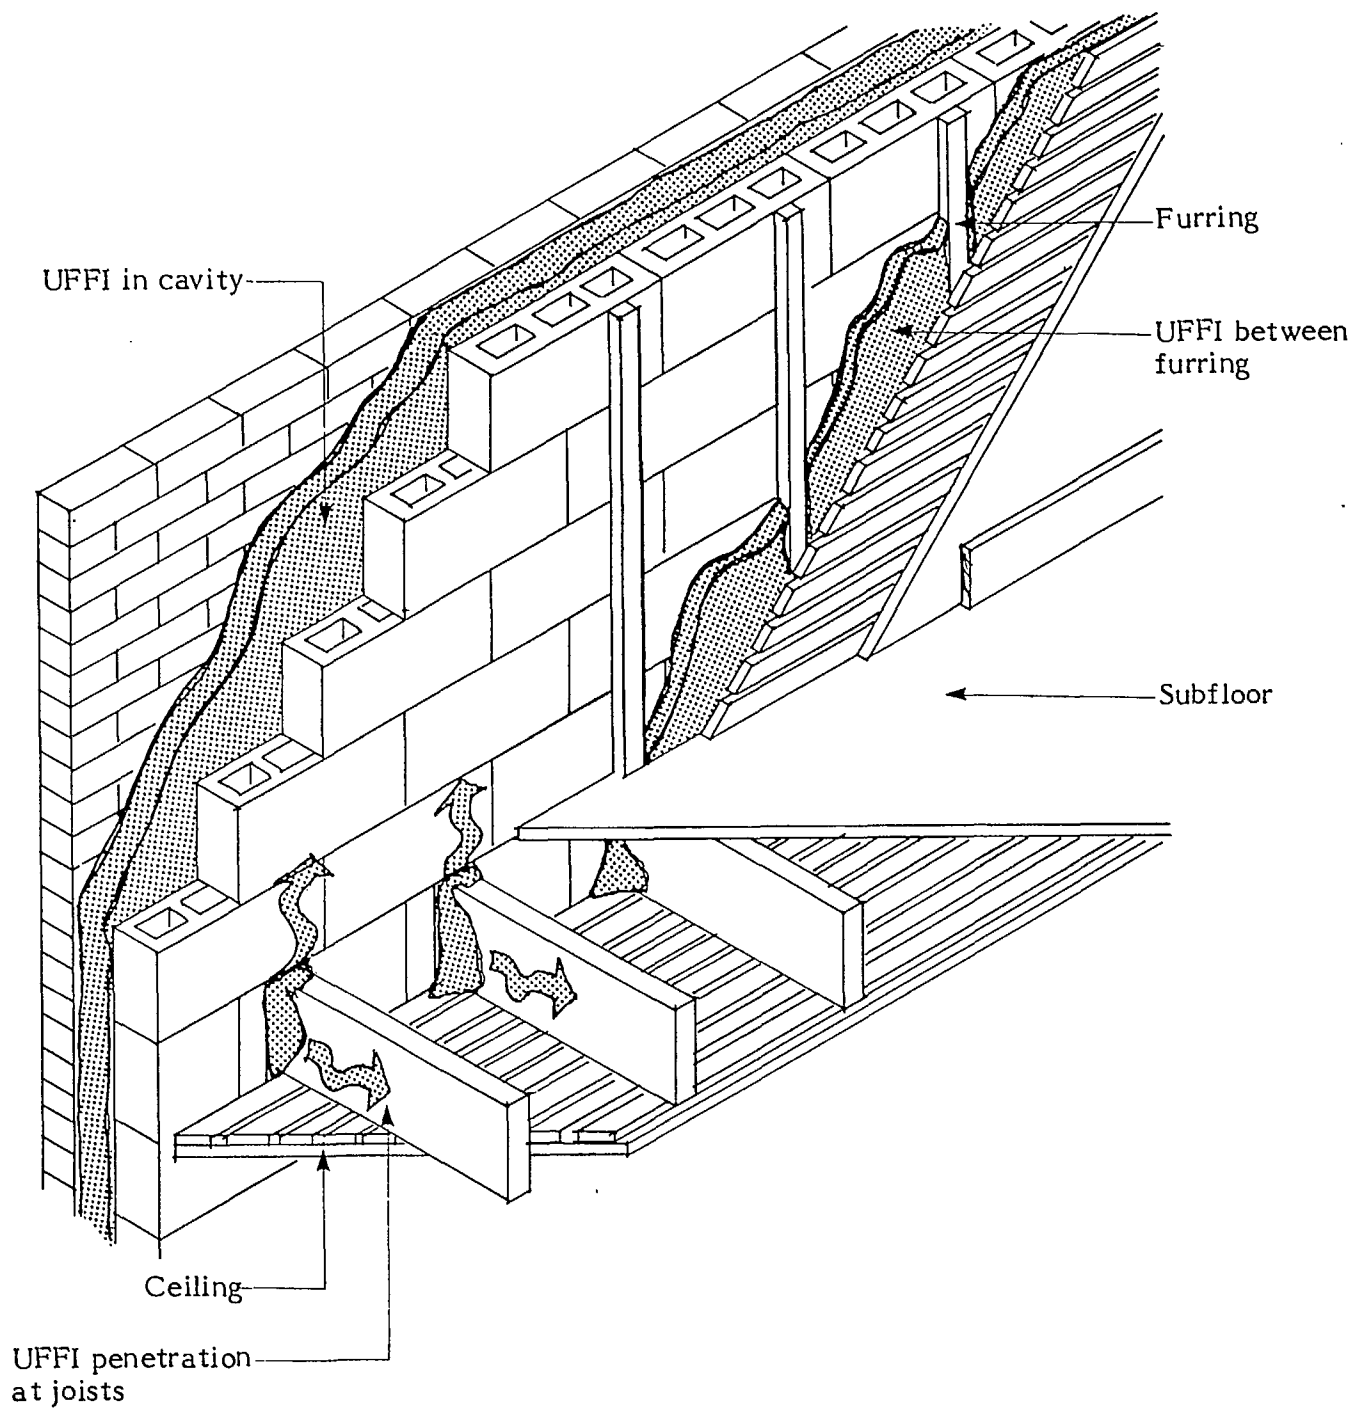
BRICK/BLOCK CAVITY WALL
